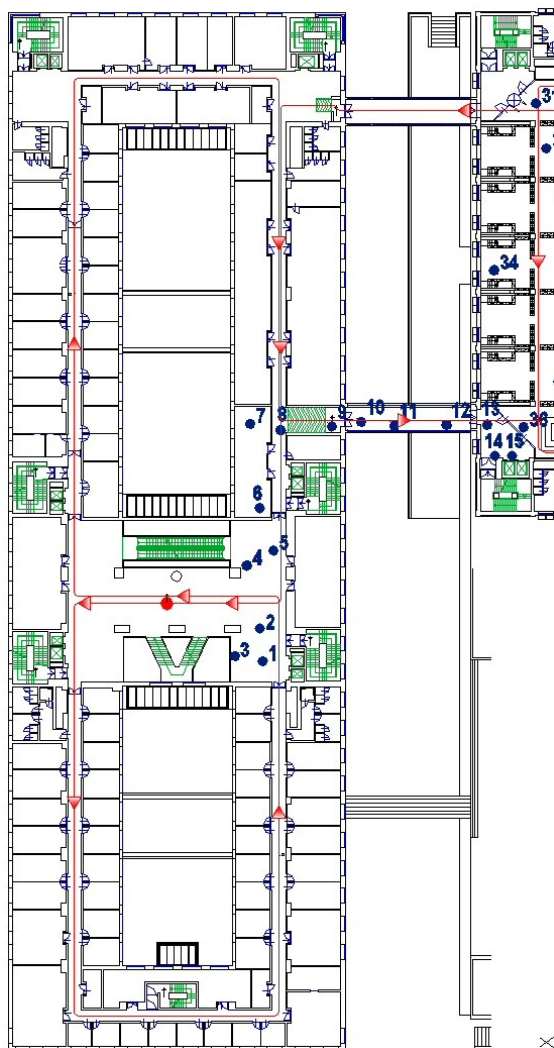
Bicocca building A, enlarged view of floor j^{th} .
